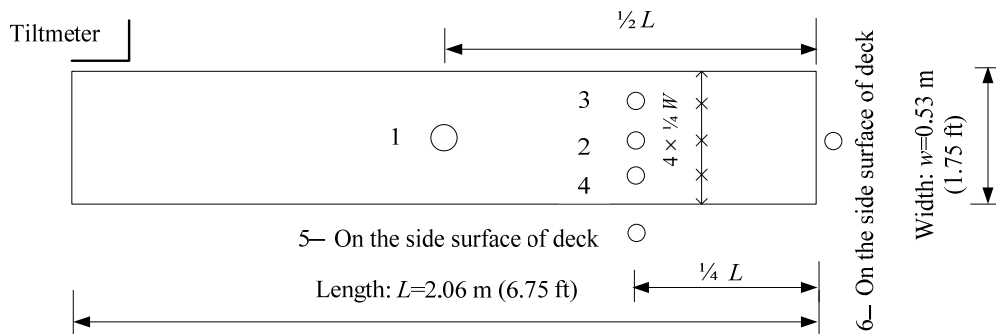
Plan View of Bridge Deck and Excitation Points.
